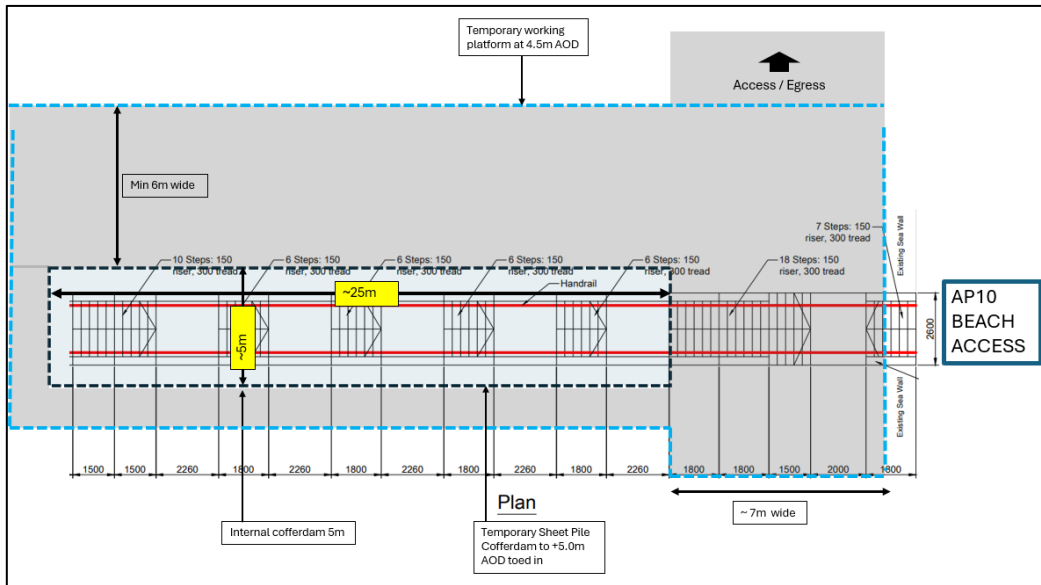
Plan View of Proposed AP10 Cofferdam Layout
